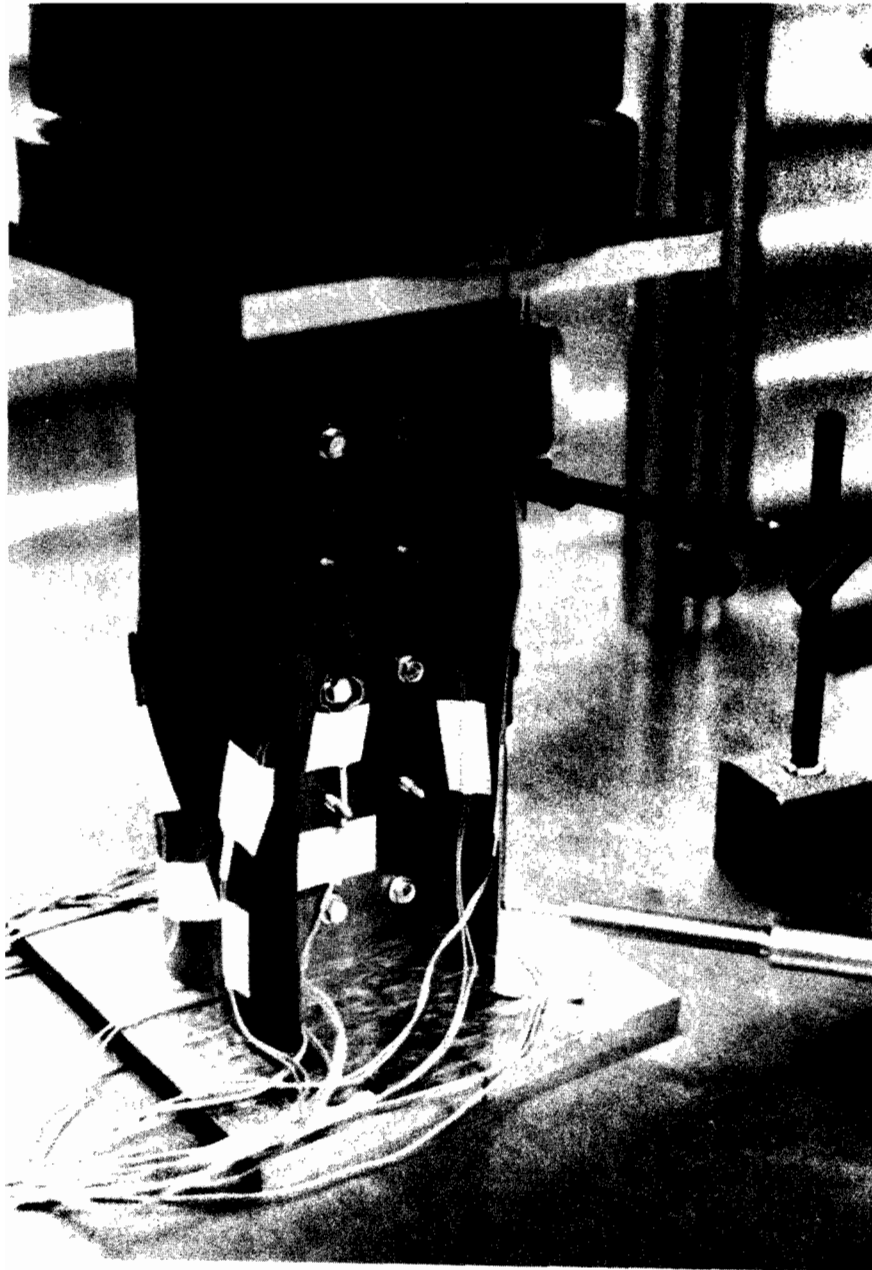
Typical Failure of the CS3 and CS2 Stub Column Specimens
